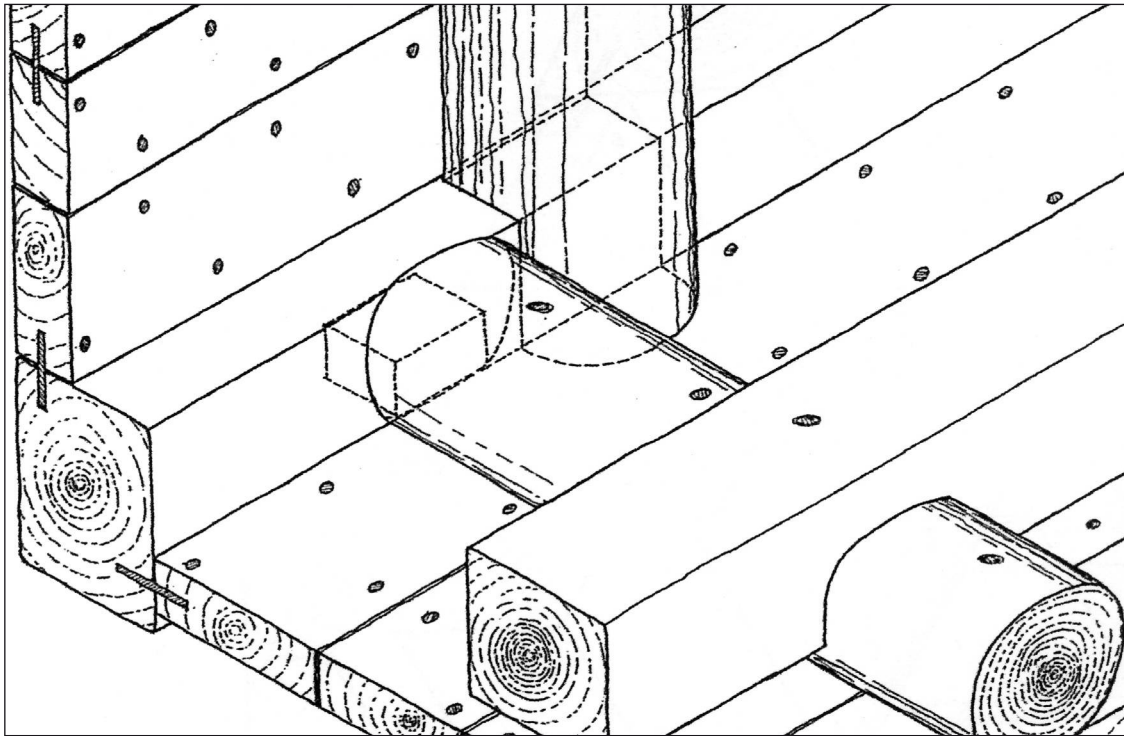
The connection point of a floor frame to the chine of the long side of the caisson (Drawing: C. Brandon)
